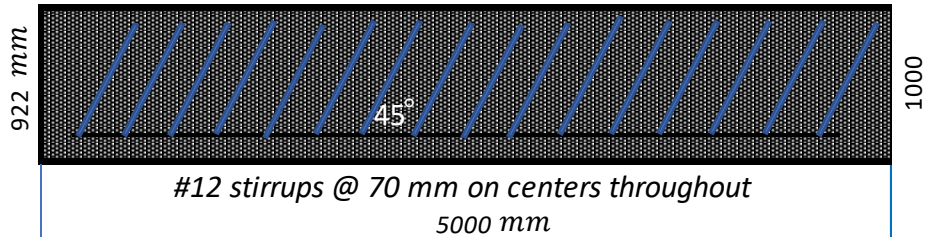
Placement of diagonal stirrups through to mid-span of the girder.
